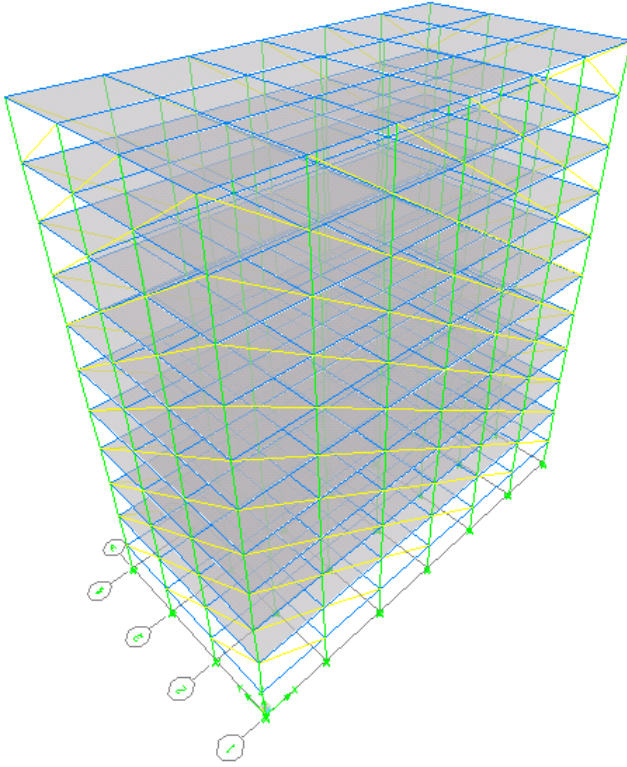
An eleven storied building frame modeled with equivalent strut 3D view from ETABS.
